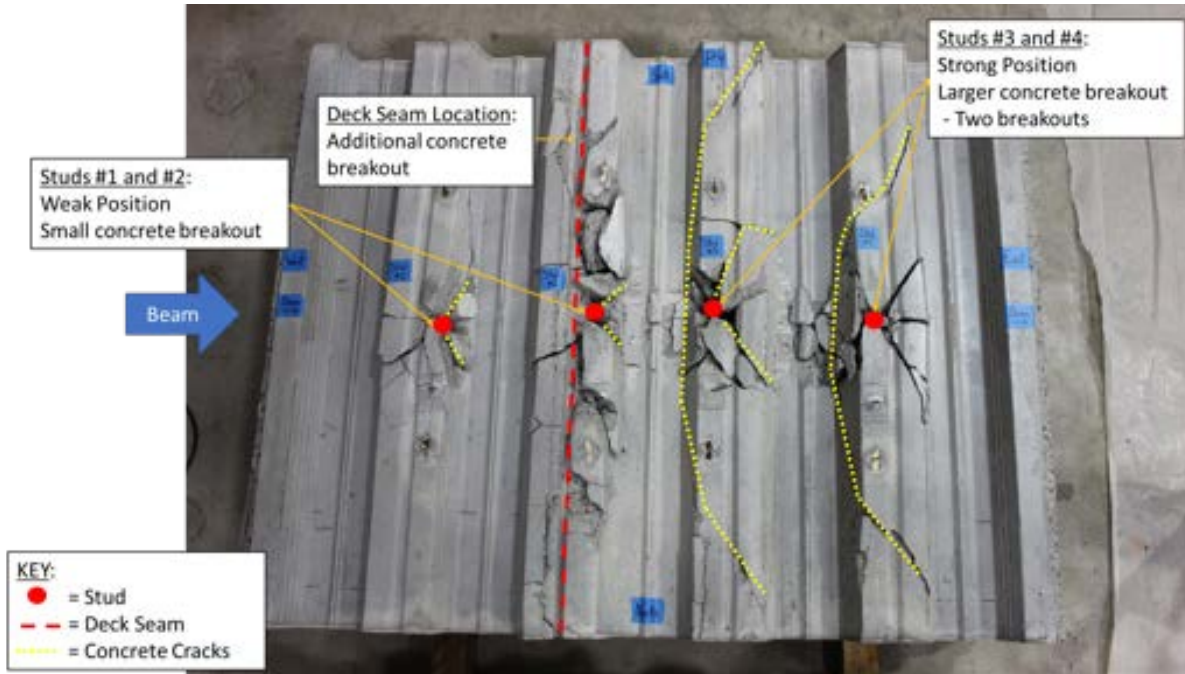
NEU Push-out Specimen 4 Concrete Failure
